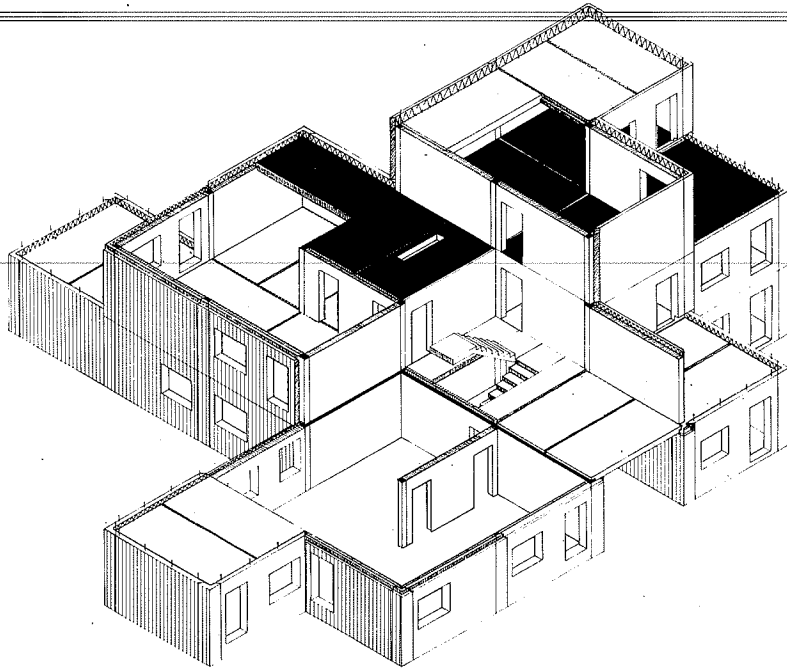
ISOMETRIC PROJECTION OF "TERRAFORM" SYSTEM
